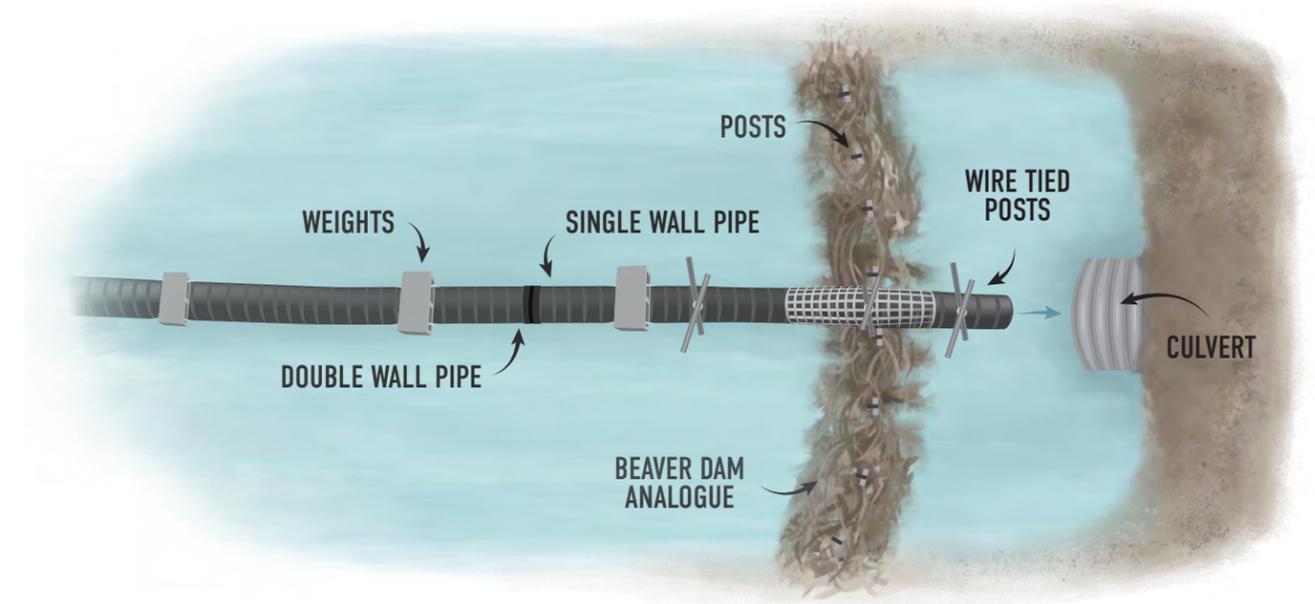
Combination of an anchor dam and pond leveler to create a pipe and dam culvert protection system.
